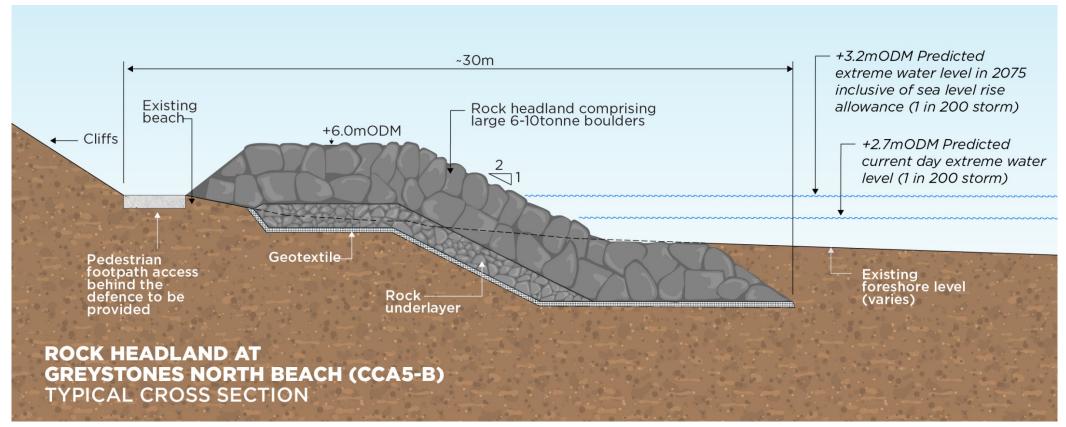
CCA5 Emerging Preferred Scheme Section at Greystones North Beach
